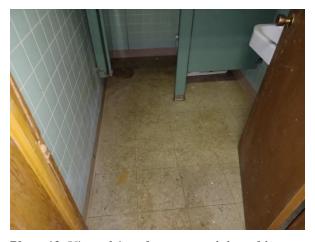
View of the asbestos containing white floor tile and underlying black mastic in the showroom bathrooms.
